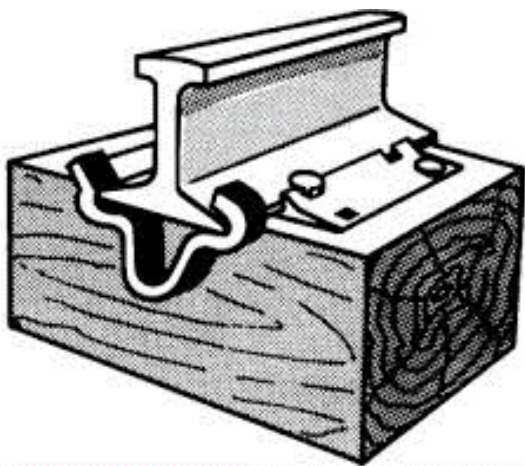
Woodings Rail Anchor (Left) & Wood Tie with e-Clip (Victor Plate)
